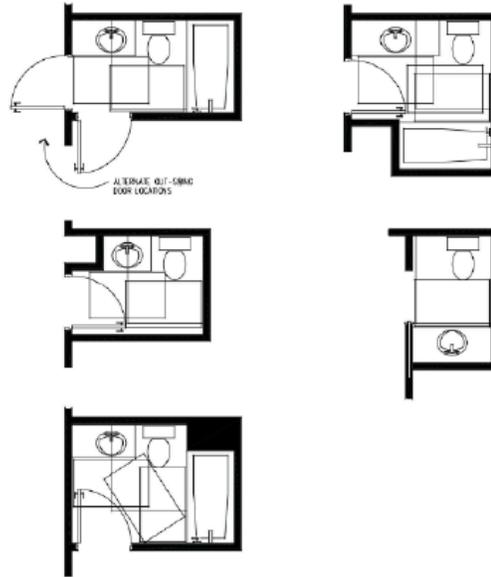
EXAMPLES OF BATHROOMS WITH FLOOR AREA TO SUITE “MINIMALLY ACCESSIBLE” REQUIREMENTS
